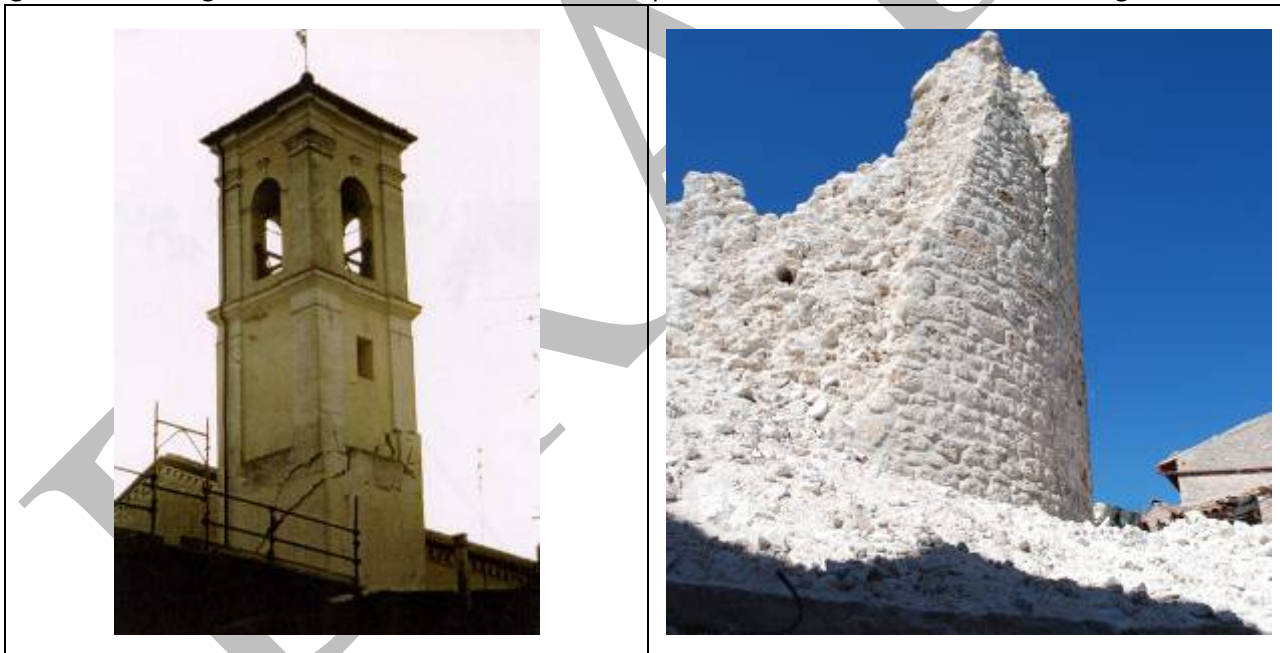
Class C - Damage to masonry elements subjected to combined axial and bending loads: towers.
